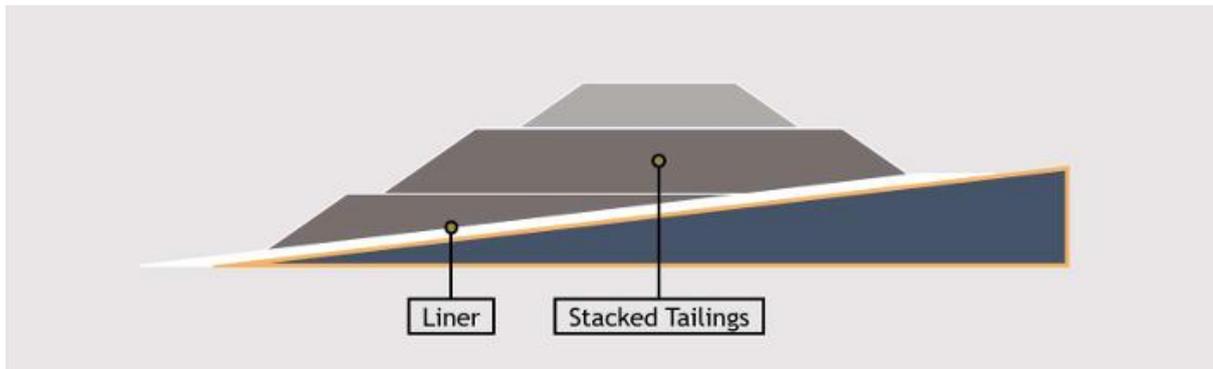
Filtered / Dry Stacking Tailing Storage Facility design (Yanama Gold, 2023)
